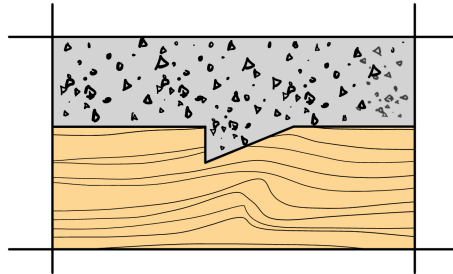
Notched connection (remade by author, adapted from Johari et al. (2023))
